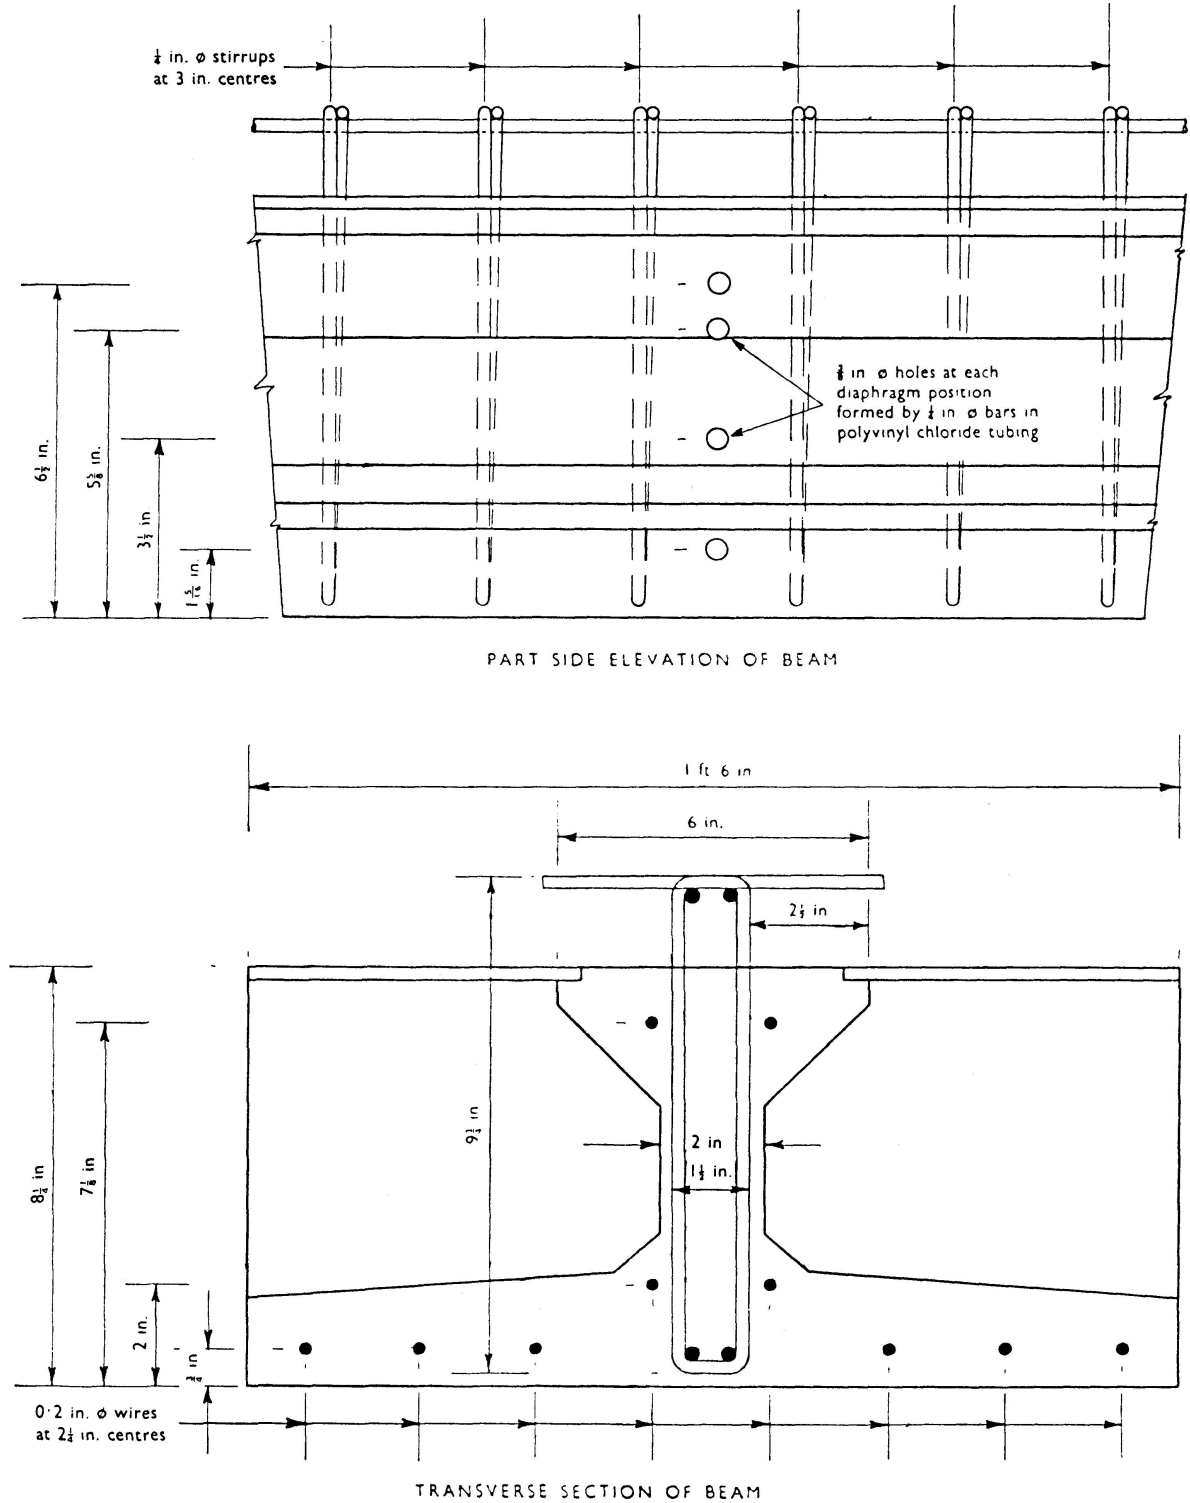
Box-Section Bridge — Modified Longitudinal and Transverse Sections of Inverted T-Beam.
